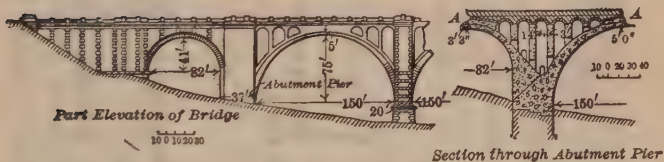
Connecticut Ave. Bridge, Washington, D. C.
